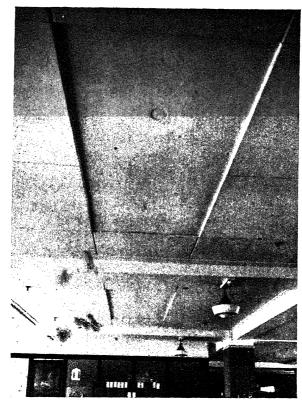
"Sunzway" radiators mounted on ceiling and ceiling finished and decorated
